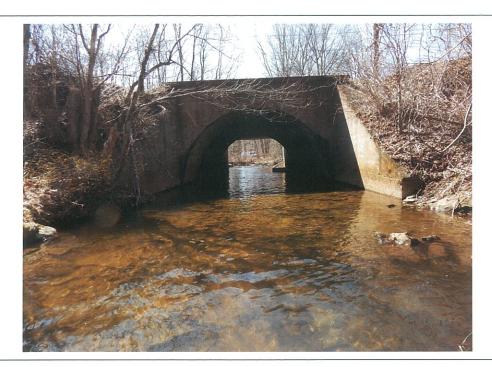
North elevation, looking south. Note tree and vegetation growth behind the northeast and northwest wingwalls.
